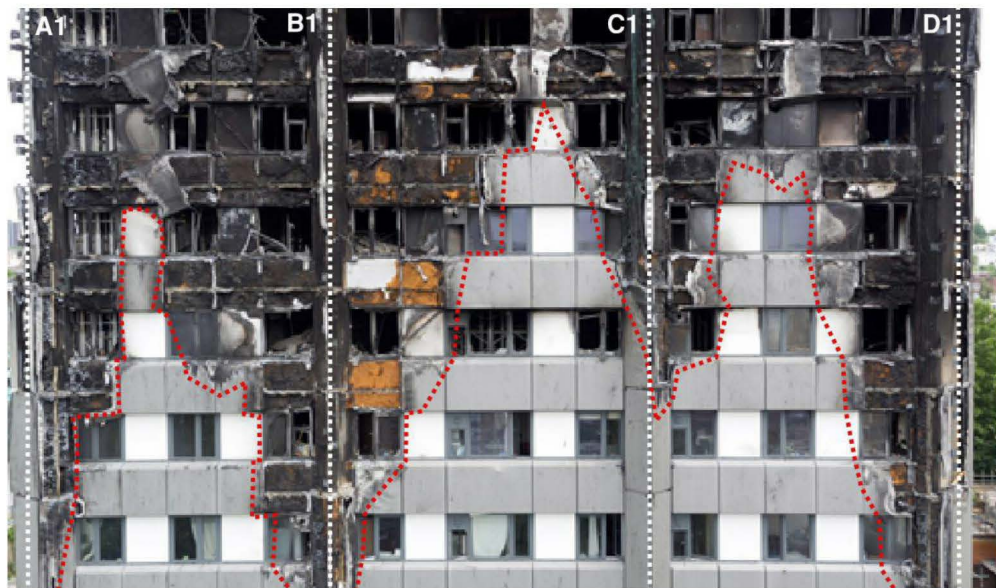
Post-fire damage on West elevation of Grenfell Tower (METS00020661)
